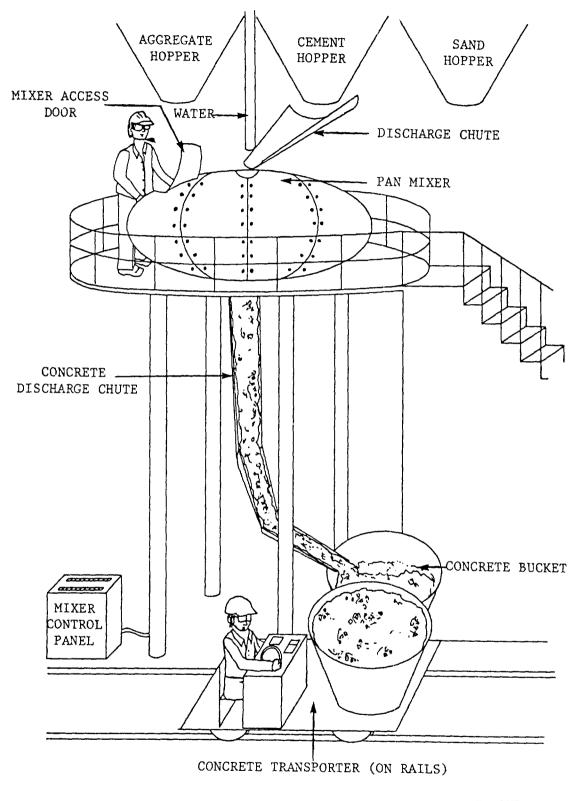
CONCRETE BATCHING, MIXING, DISCHARGE, AND TRANSPORT SYSTEM
